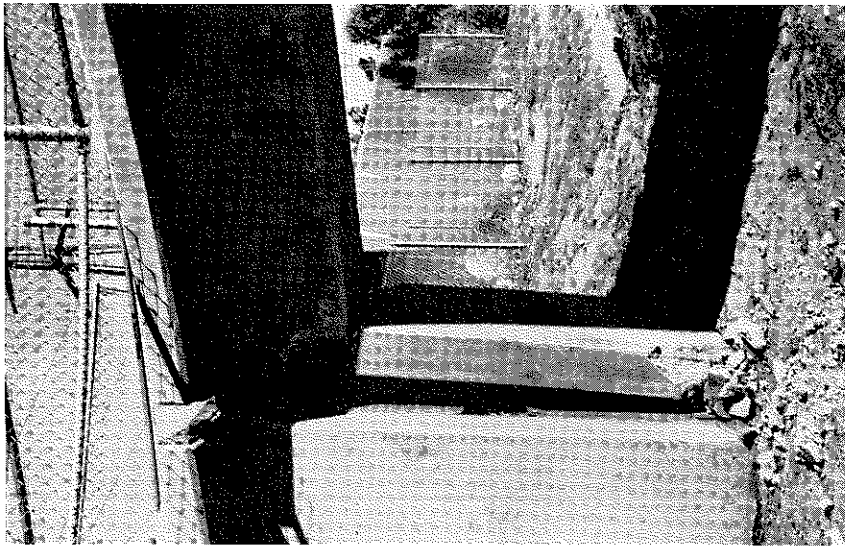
Northeastern abutment of the Astoria Street footbridge, Foothill freeway.
